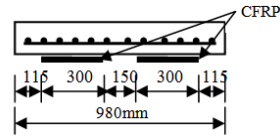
Geometrical properties of strengthened slabs with two one layer longitudinal 300 mm wide CFRP strips
